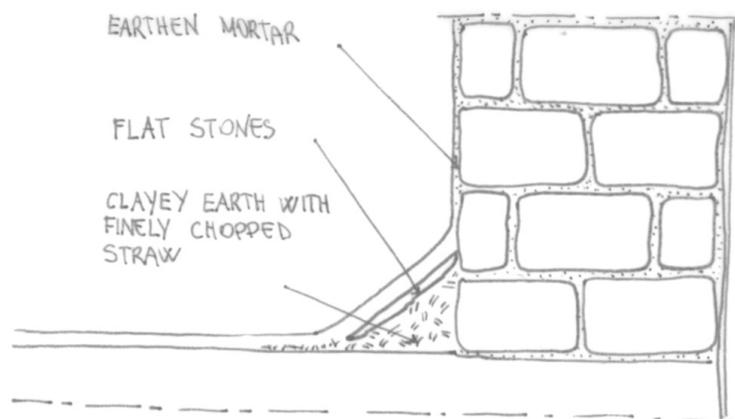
Improving connection joints between plane roof and vertical walls
